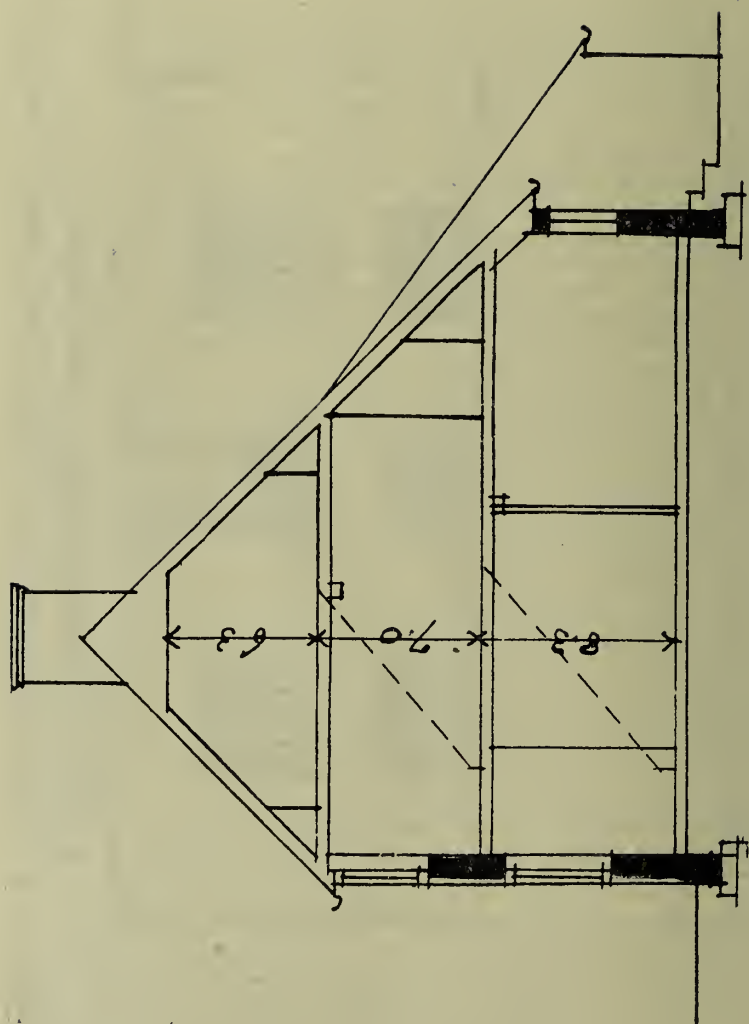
Section. (Original Walls Black - Additions in Outline).
